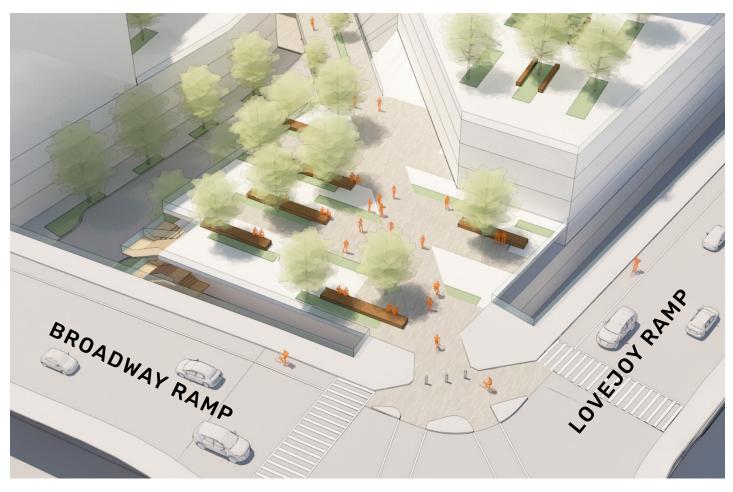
The Green Loop connects to the Broadway and Lovejoy ramps and creates a unique elevated urban plaza.
